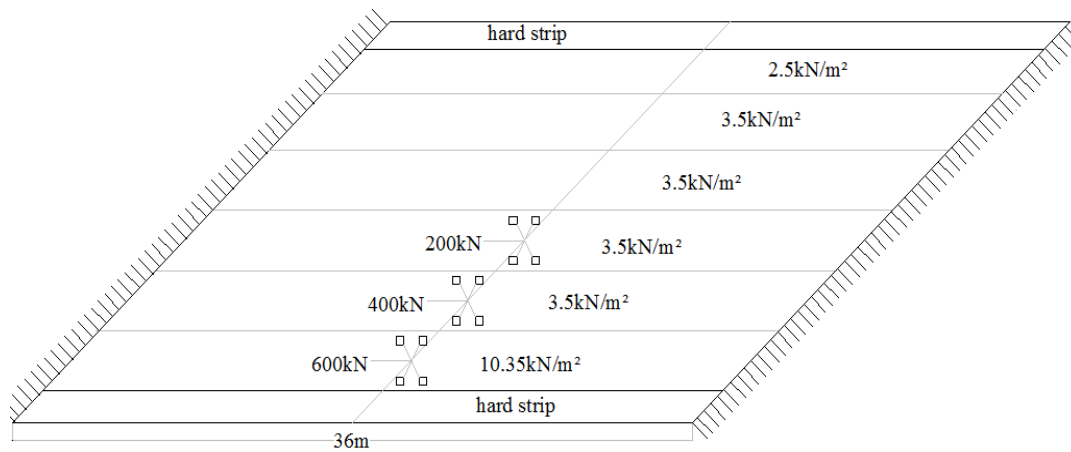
1, Load cases and arrangement for maximum longitudinal bending in the girders
